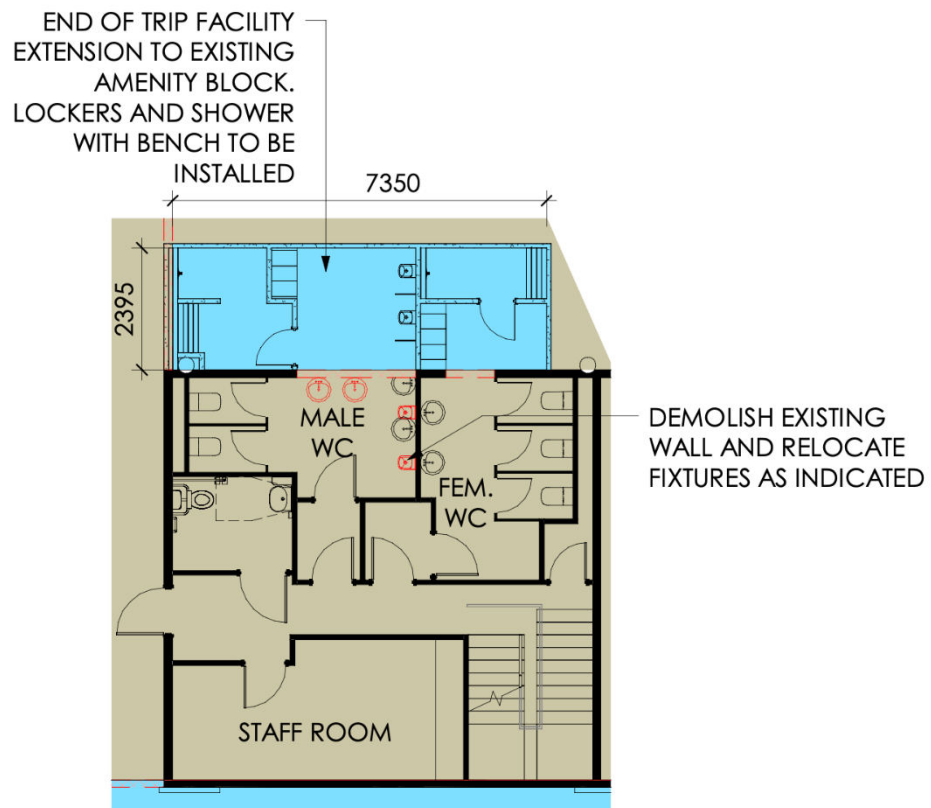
Proposed Ground Floor End-of-Trip Facility
